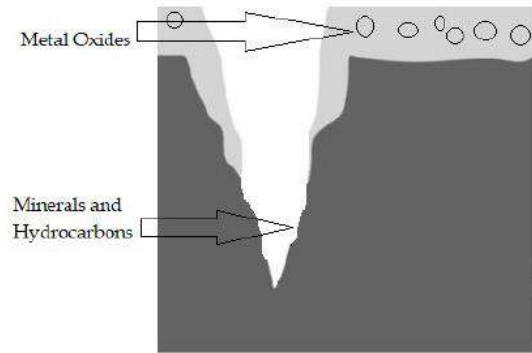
Schematic diagram showing the cross sectional view in a road pavement crack.
